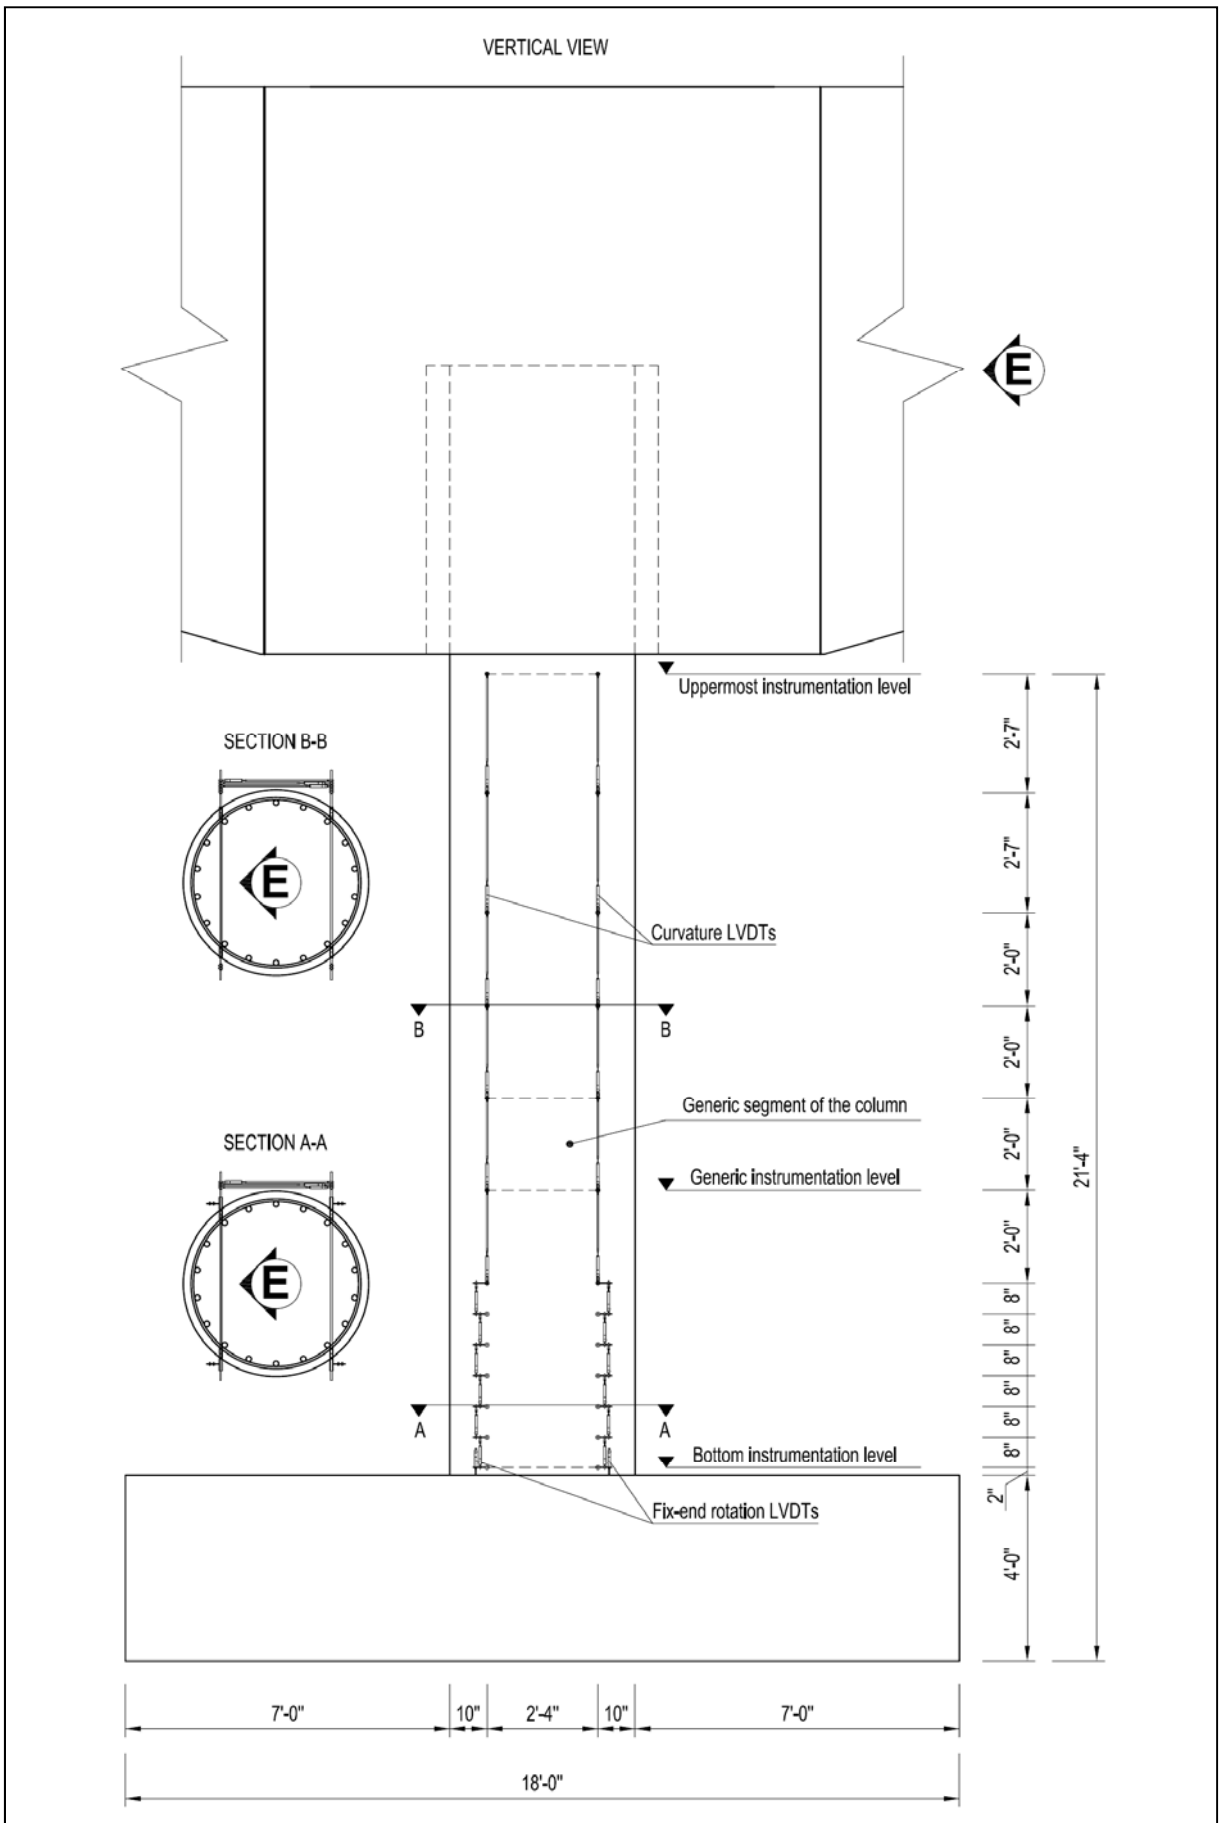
Curvature and shear LVDTs on the North side of the column (Scale 1:50)
